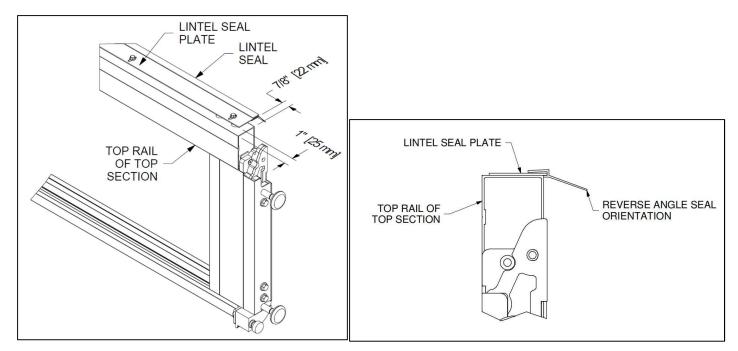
LINTEL SEAL FASTENED TO TOP SECTION
